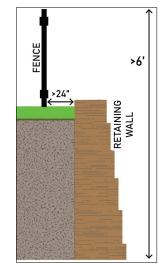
A-2-E-2-II: Requirement for fence location when retaining wall is not adjacent to walkway and fence + wall is taller than six feet.
